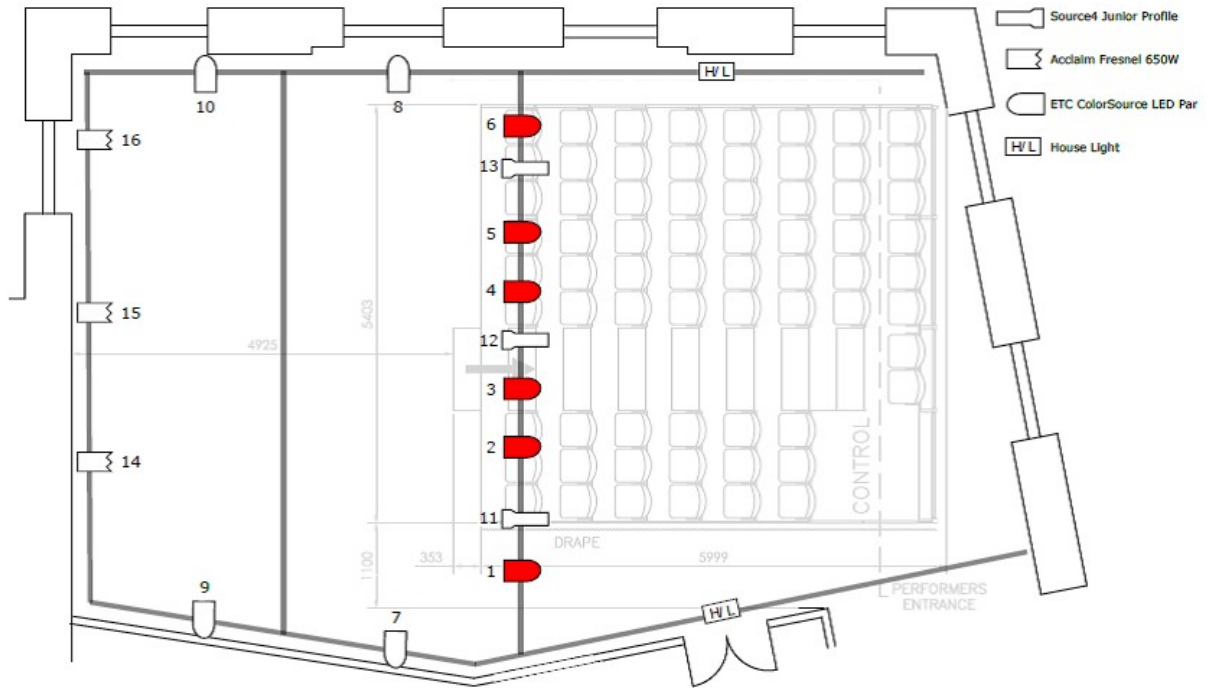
Quaker Meeting House Venue 40 Festival Stage Plan.
